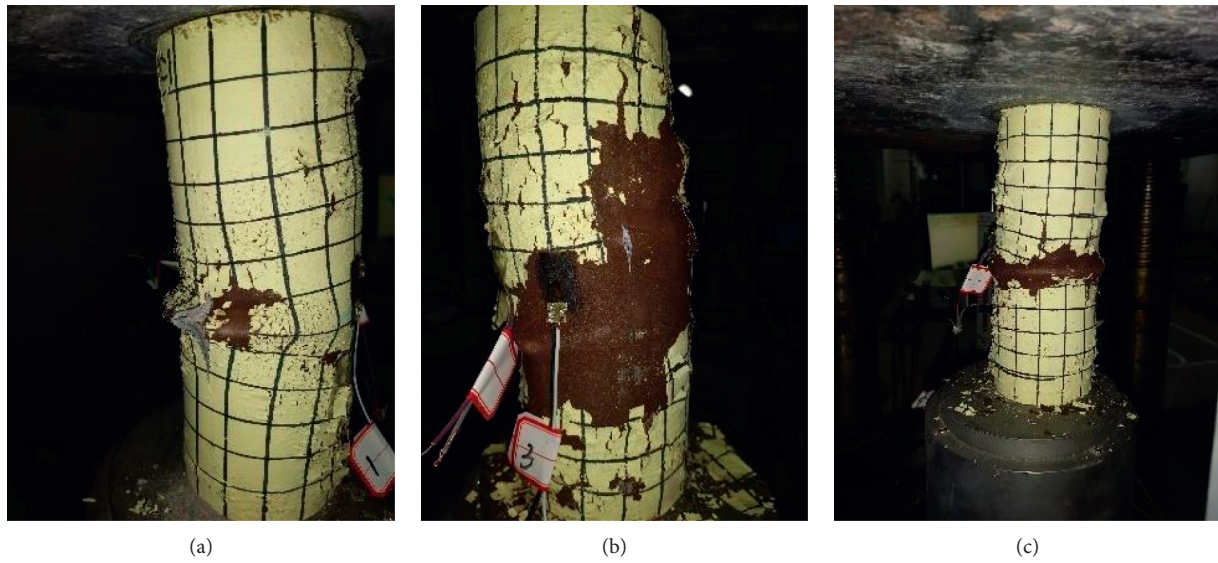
Typical failure modes of tested specimens. (a) C1. (b) C4. (c) C6.
